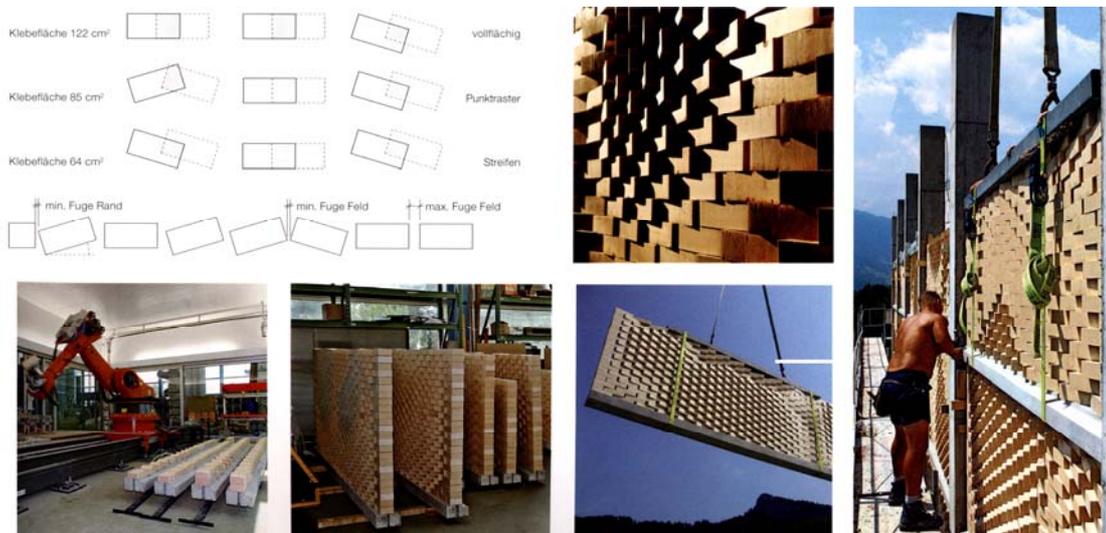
The manufacture of the wall of weinguts in Fläsch (Source: *Elemente + Systeme*, 2008)
